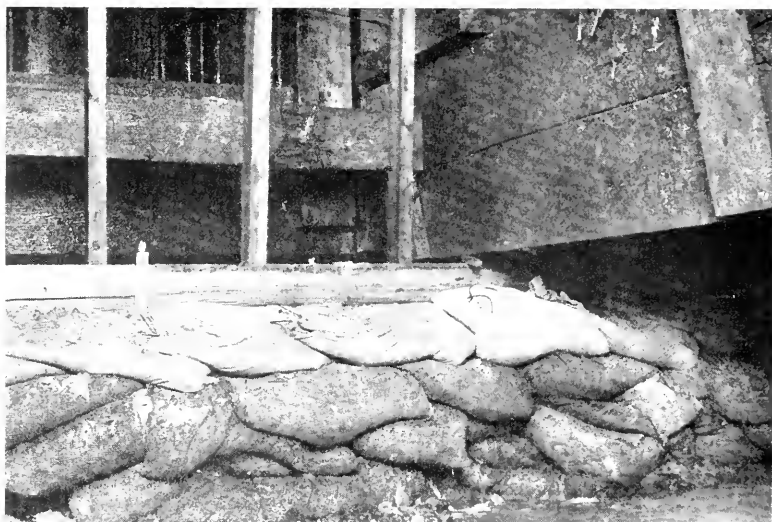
TOP OF CONCRETE PIER 38 AT GRADE 76±.
